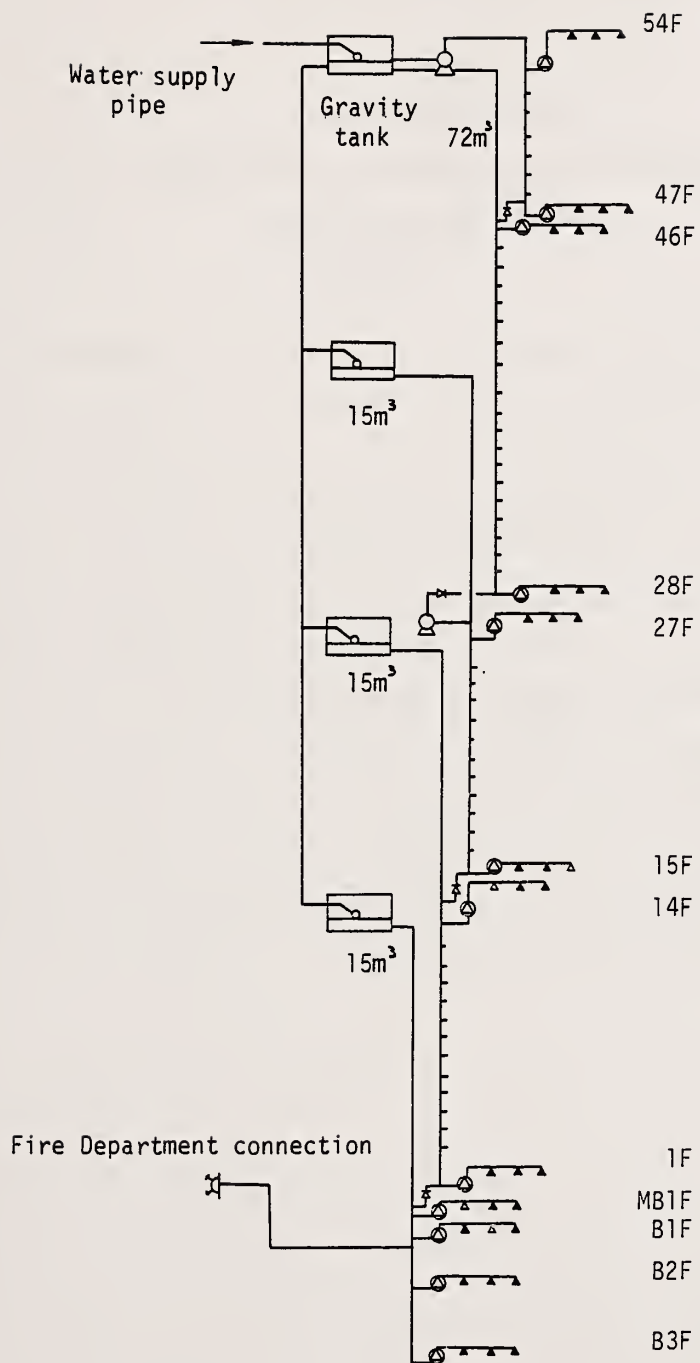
Water supply arrangement for sprinkler system in high-rise building
